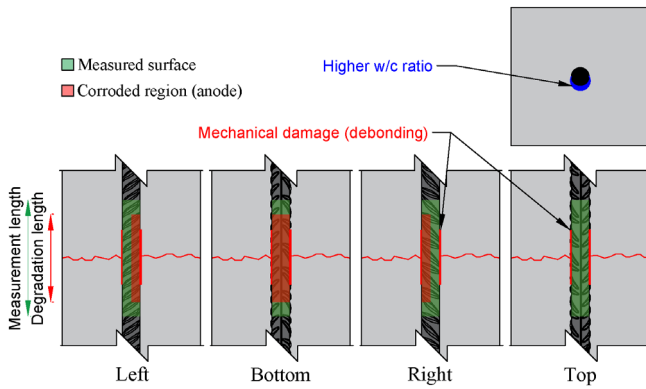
Degradation scenario at the intersection of reinforcement and cracks.
